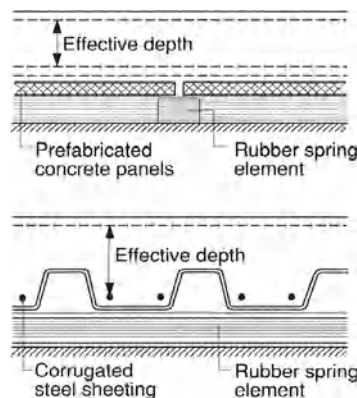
Floating slab constructed with the lost-form-method: a) prefabricated concrete panels, b) corrugated steel sheeting [4.2]
